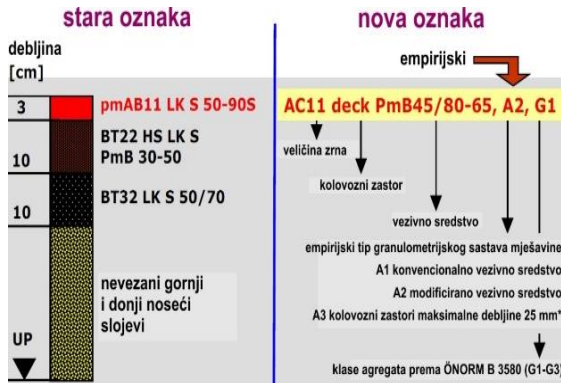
Asphalt pavement according to empirical recommendations in Austria [2]
